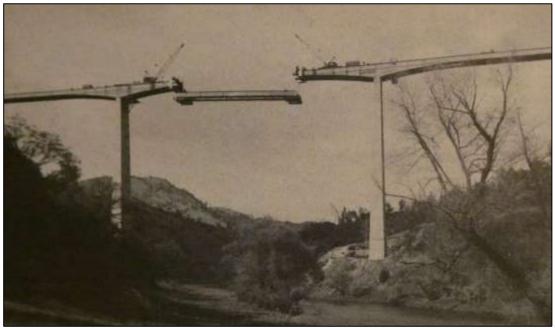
The 890-ton, 257-foot center section of the main span hoisted 376 feet into place in April 1976.⁵
